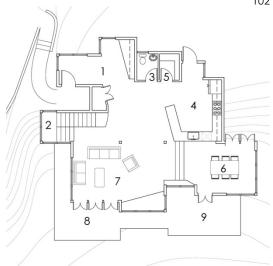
First Floor Plan - 1. Entry 2. Stairs 3.
